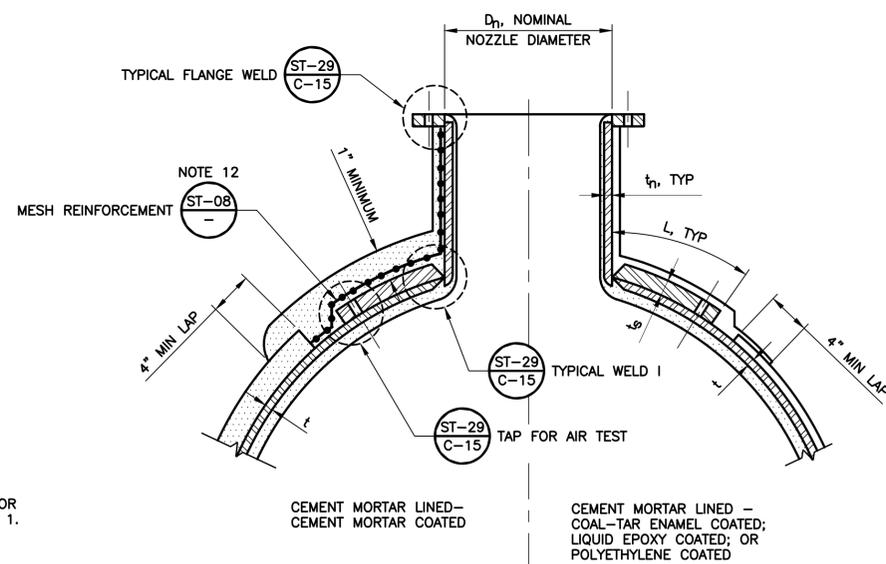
NOZZLE WITH WRAPPED REINFORCEMENT
